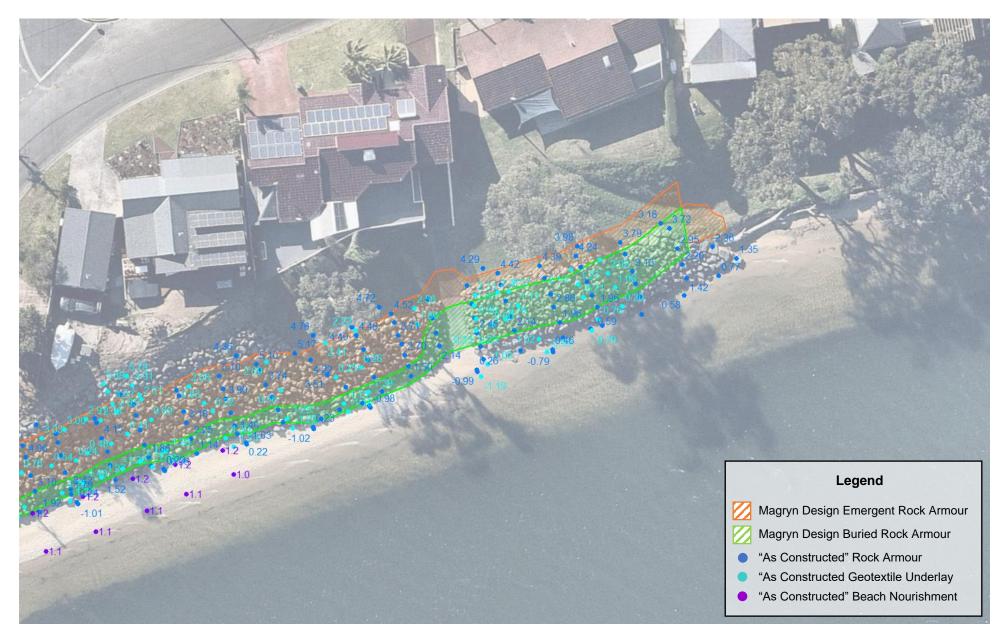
Magryn design revetment alignment and as construced armour stone levels, post-construction background image
